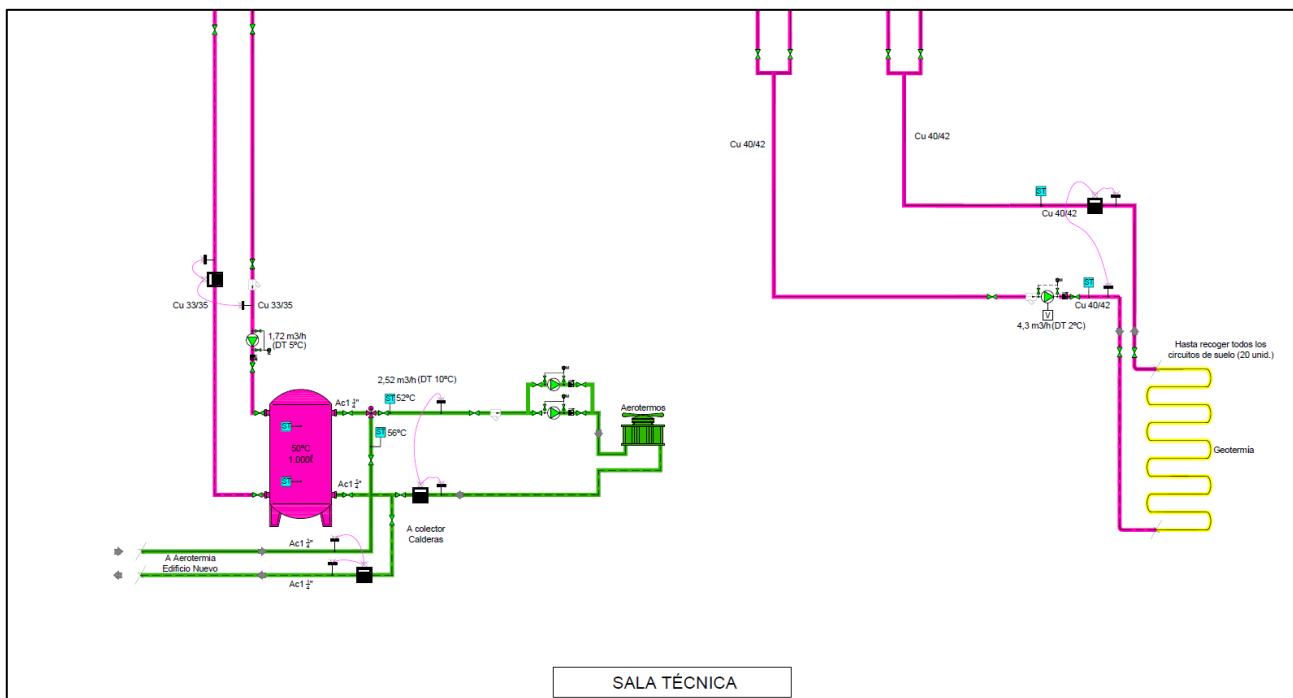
Piping and instrumentation diagram and thermally activated foundation, technical room
